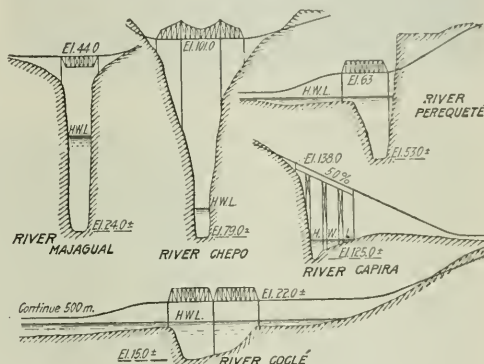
TYPICAL STREAM SECTIONS AND BRIDGES
